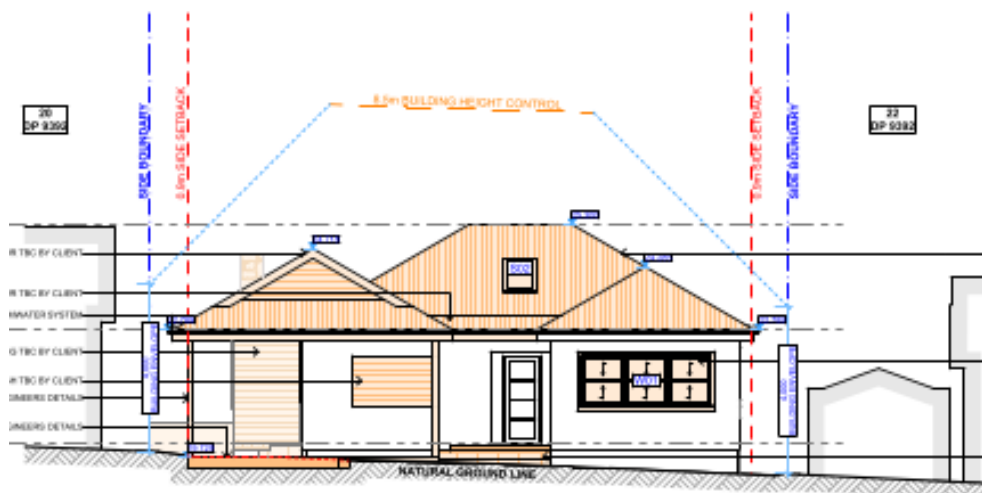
Plan Extract: North Elevation illustrating the compliant building envelope.
